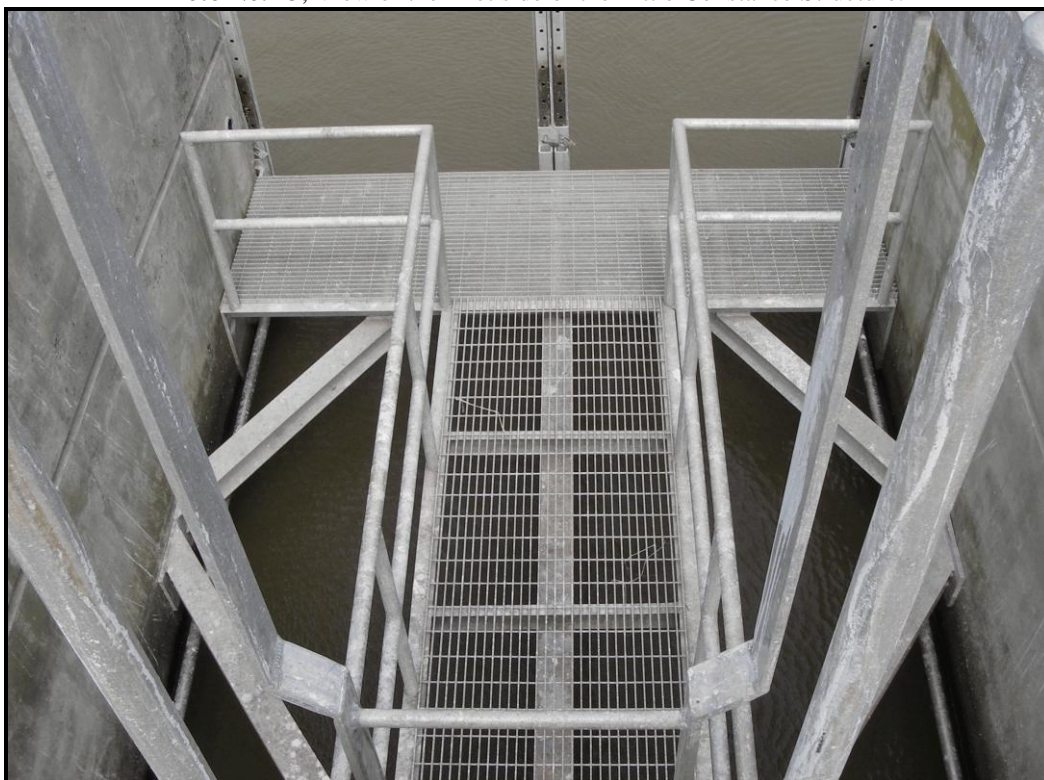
, Typical view of a refurbished structure bay including inlet weir with flap gate on the Little Constance Structure.
